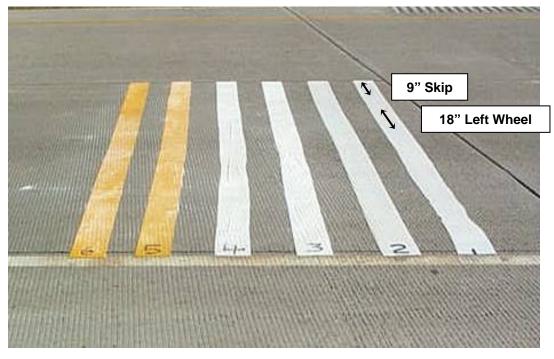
Transverse Placement of Pavement Markings on NTPEP Test Decks.
